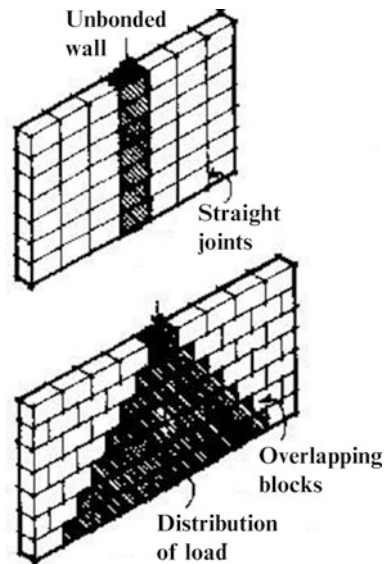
Distribution of load in a straight joint wall and in a staggered joint wall
